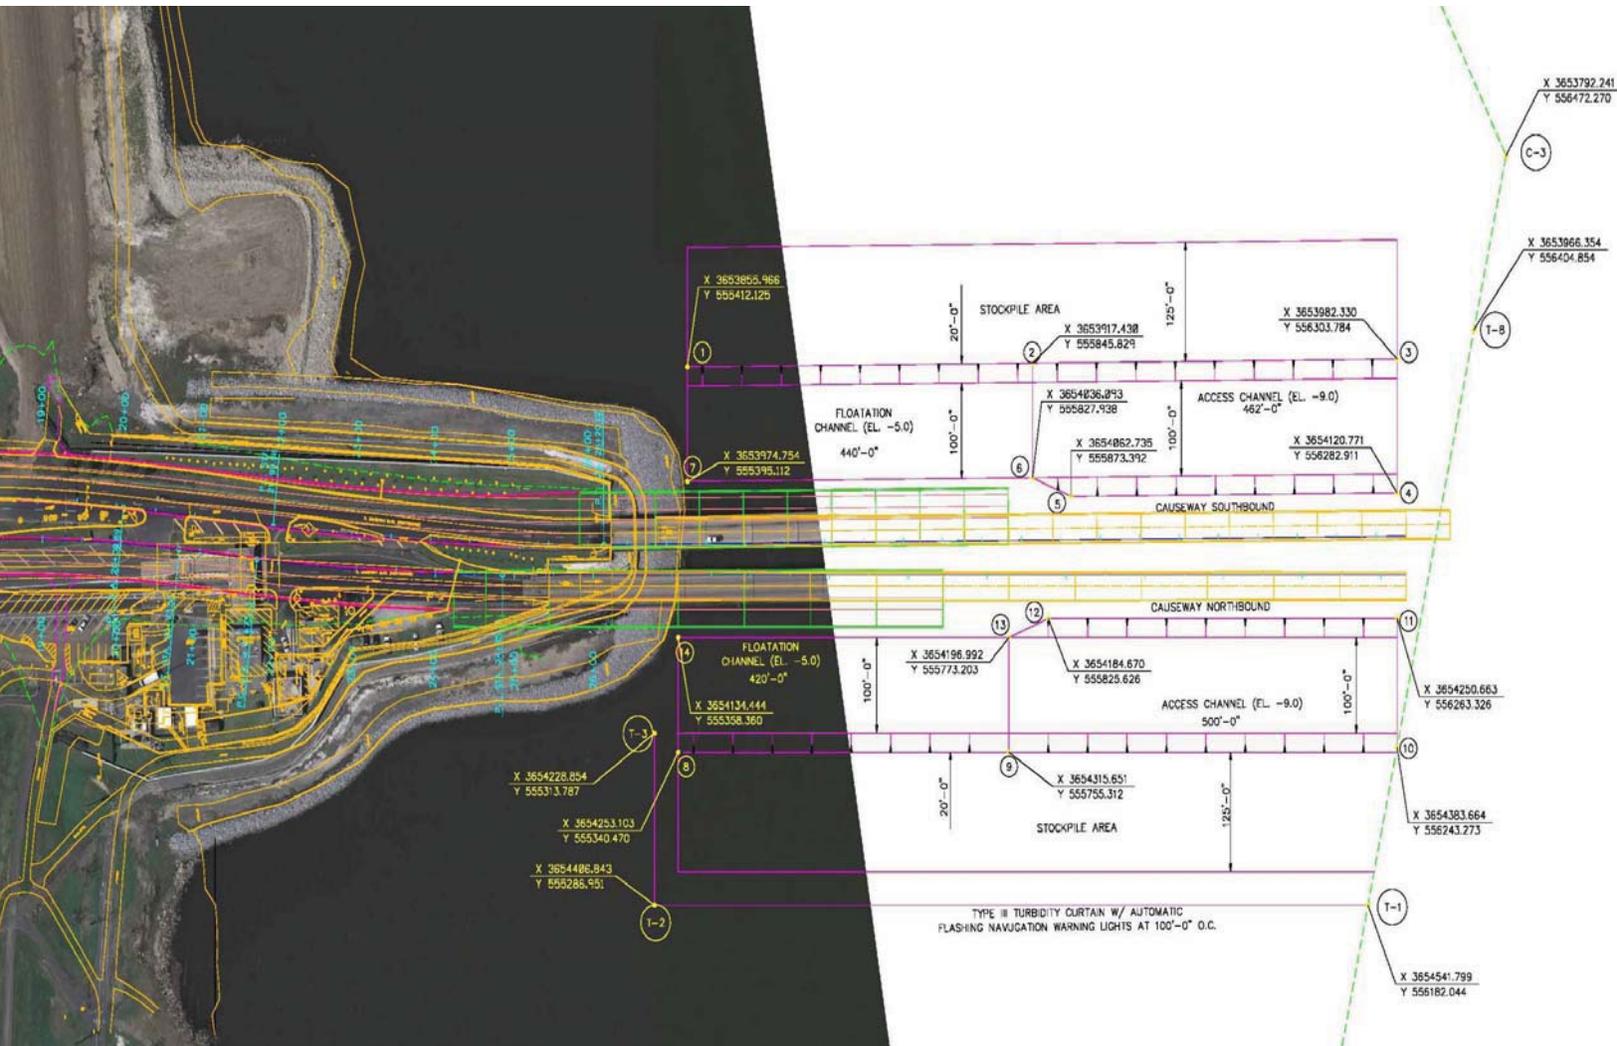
Proposed Causeway Bridge Detour Lane Access Dredging Location
